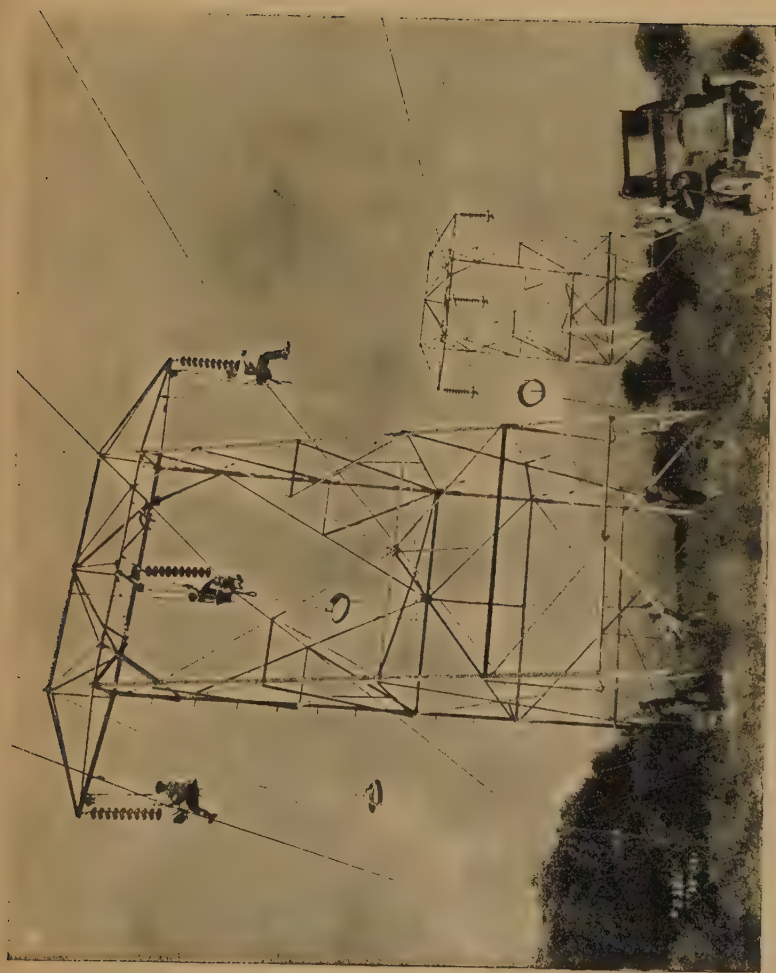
INSTALLING INSULATORS AND SHIELD RINGS ON A 220-KILOVOLT LINE.
